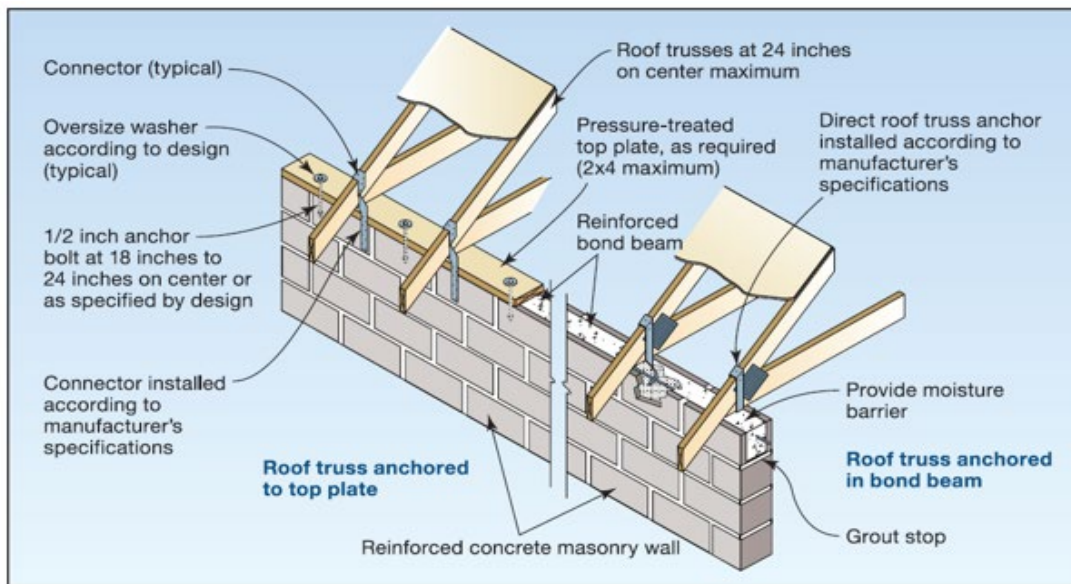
Illustration of the wood roof framing to CMU wall connections. [FEMA 55 Figure 9-10]
